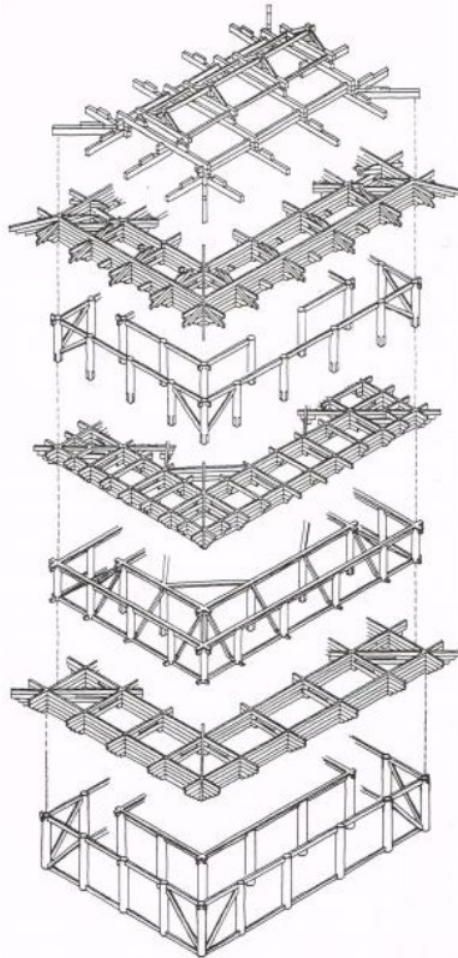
Medieval Chinese-style timber buildings of the dian ge type consisted of several storeys. The ground floor consisted of a network of columns and a puzuo unit, providing strength to the construction. Each of the upper storeys was made up of a substructure with a smaller puzuo for additional stiffness, a network of columns and another puzuo unit. On the last puzuo unit rests the roof construction. (© Guo, 1995, p. 67).
